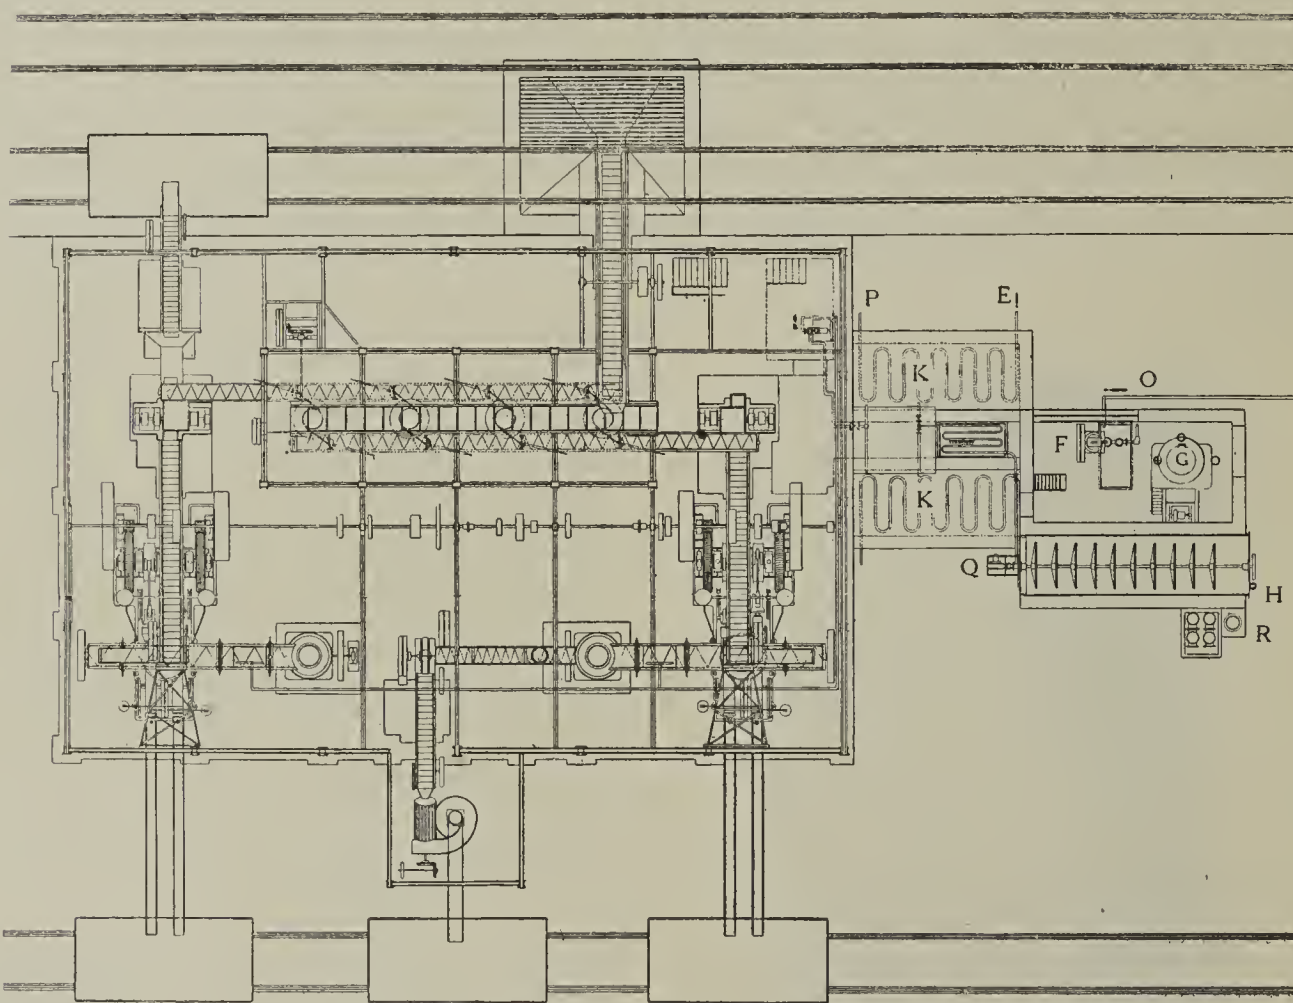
PLAN OF BRIQUETTING PLANT.
